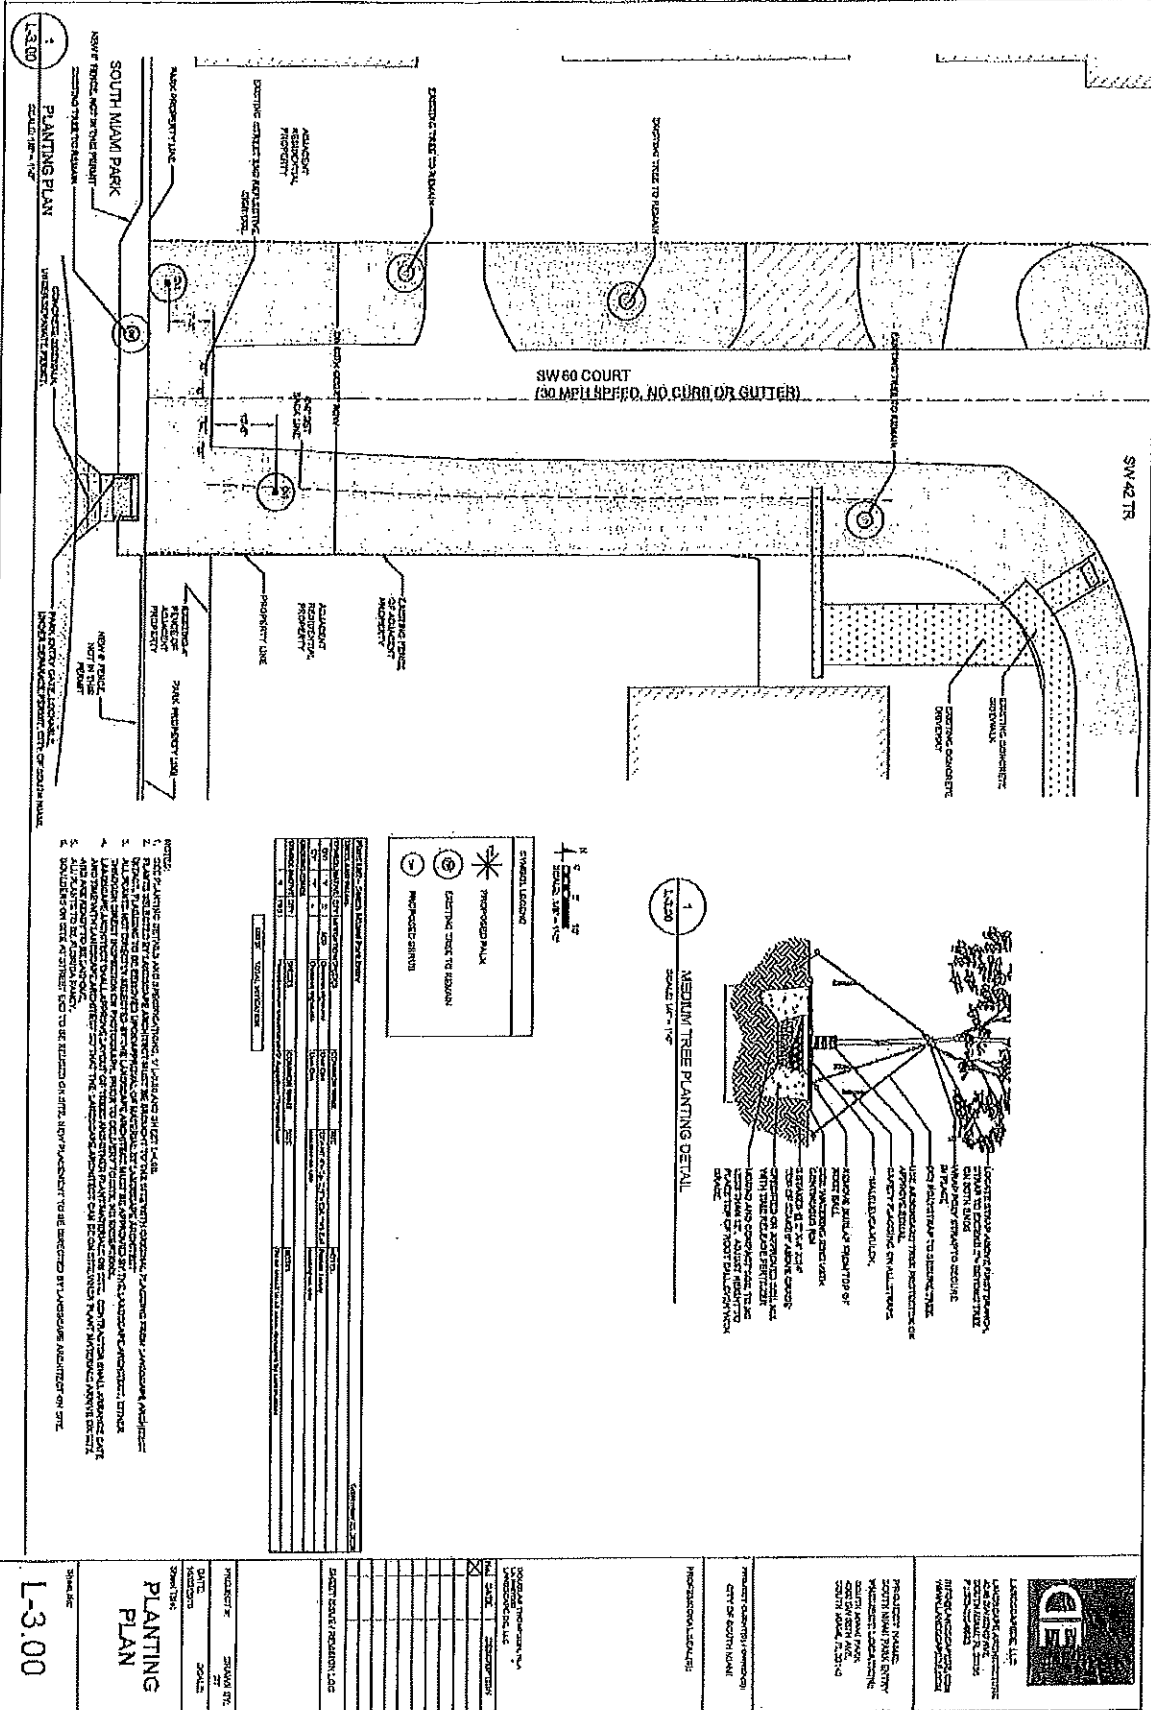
"SM PARK NW ENTRY GATE PLANS"
